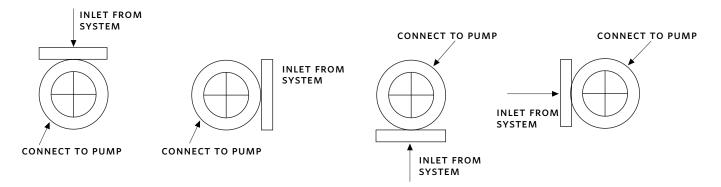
Armstrong Suction Guide may be installed in any arrangement feasible by pump flange boltholes arrangement.
